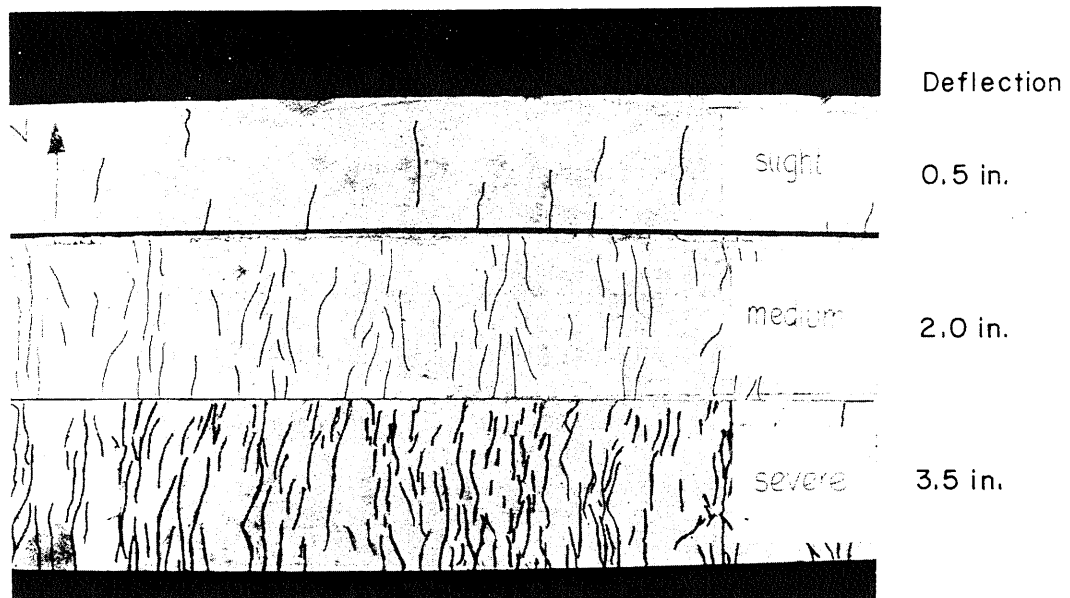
CRACK PATTERNS ON CONCRETE SURFACE
